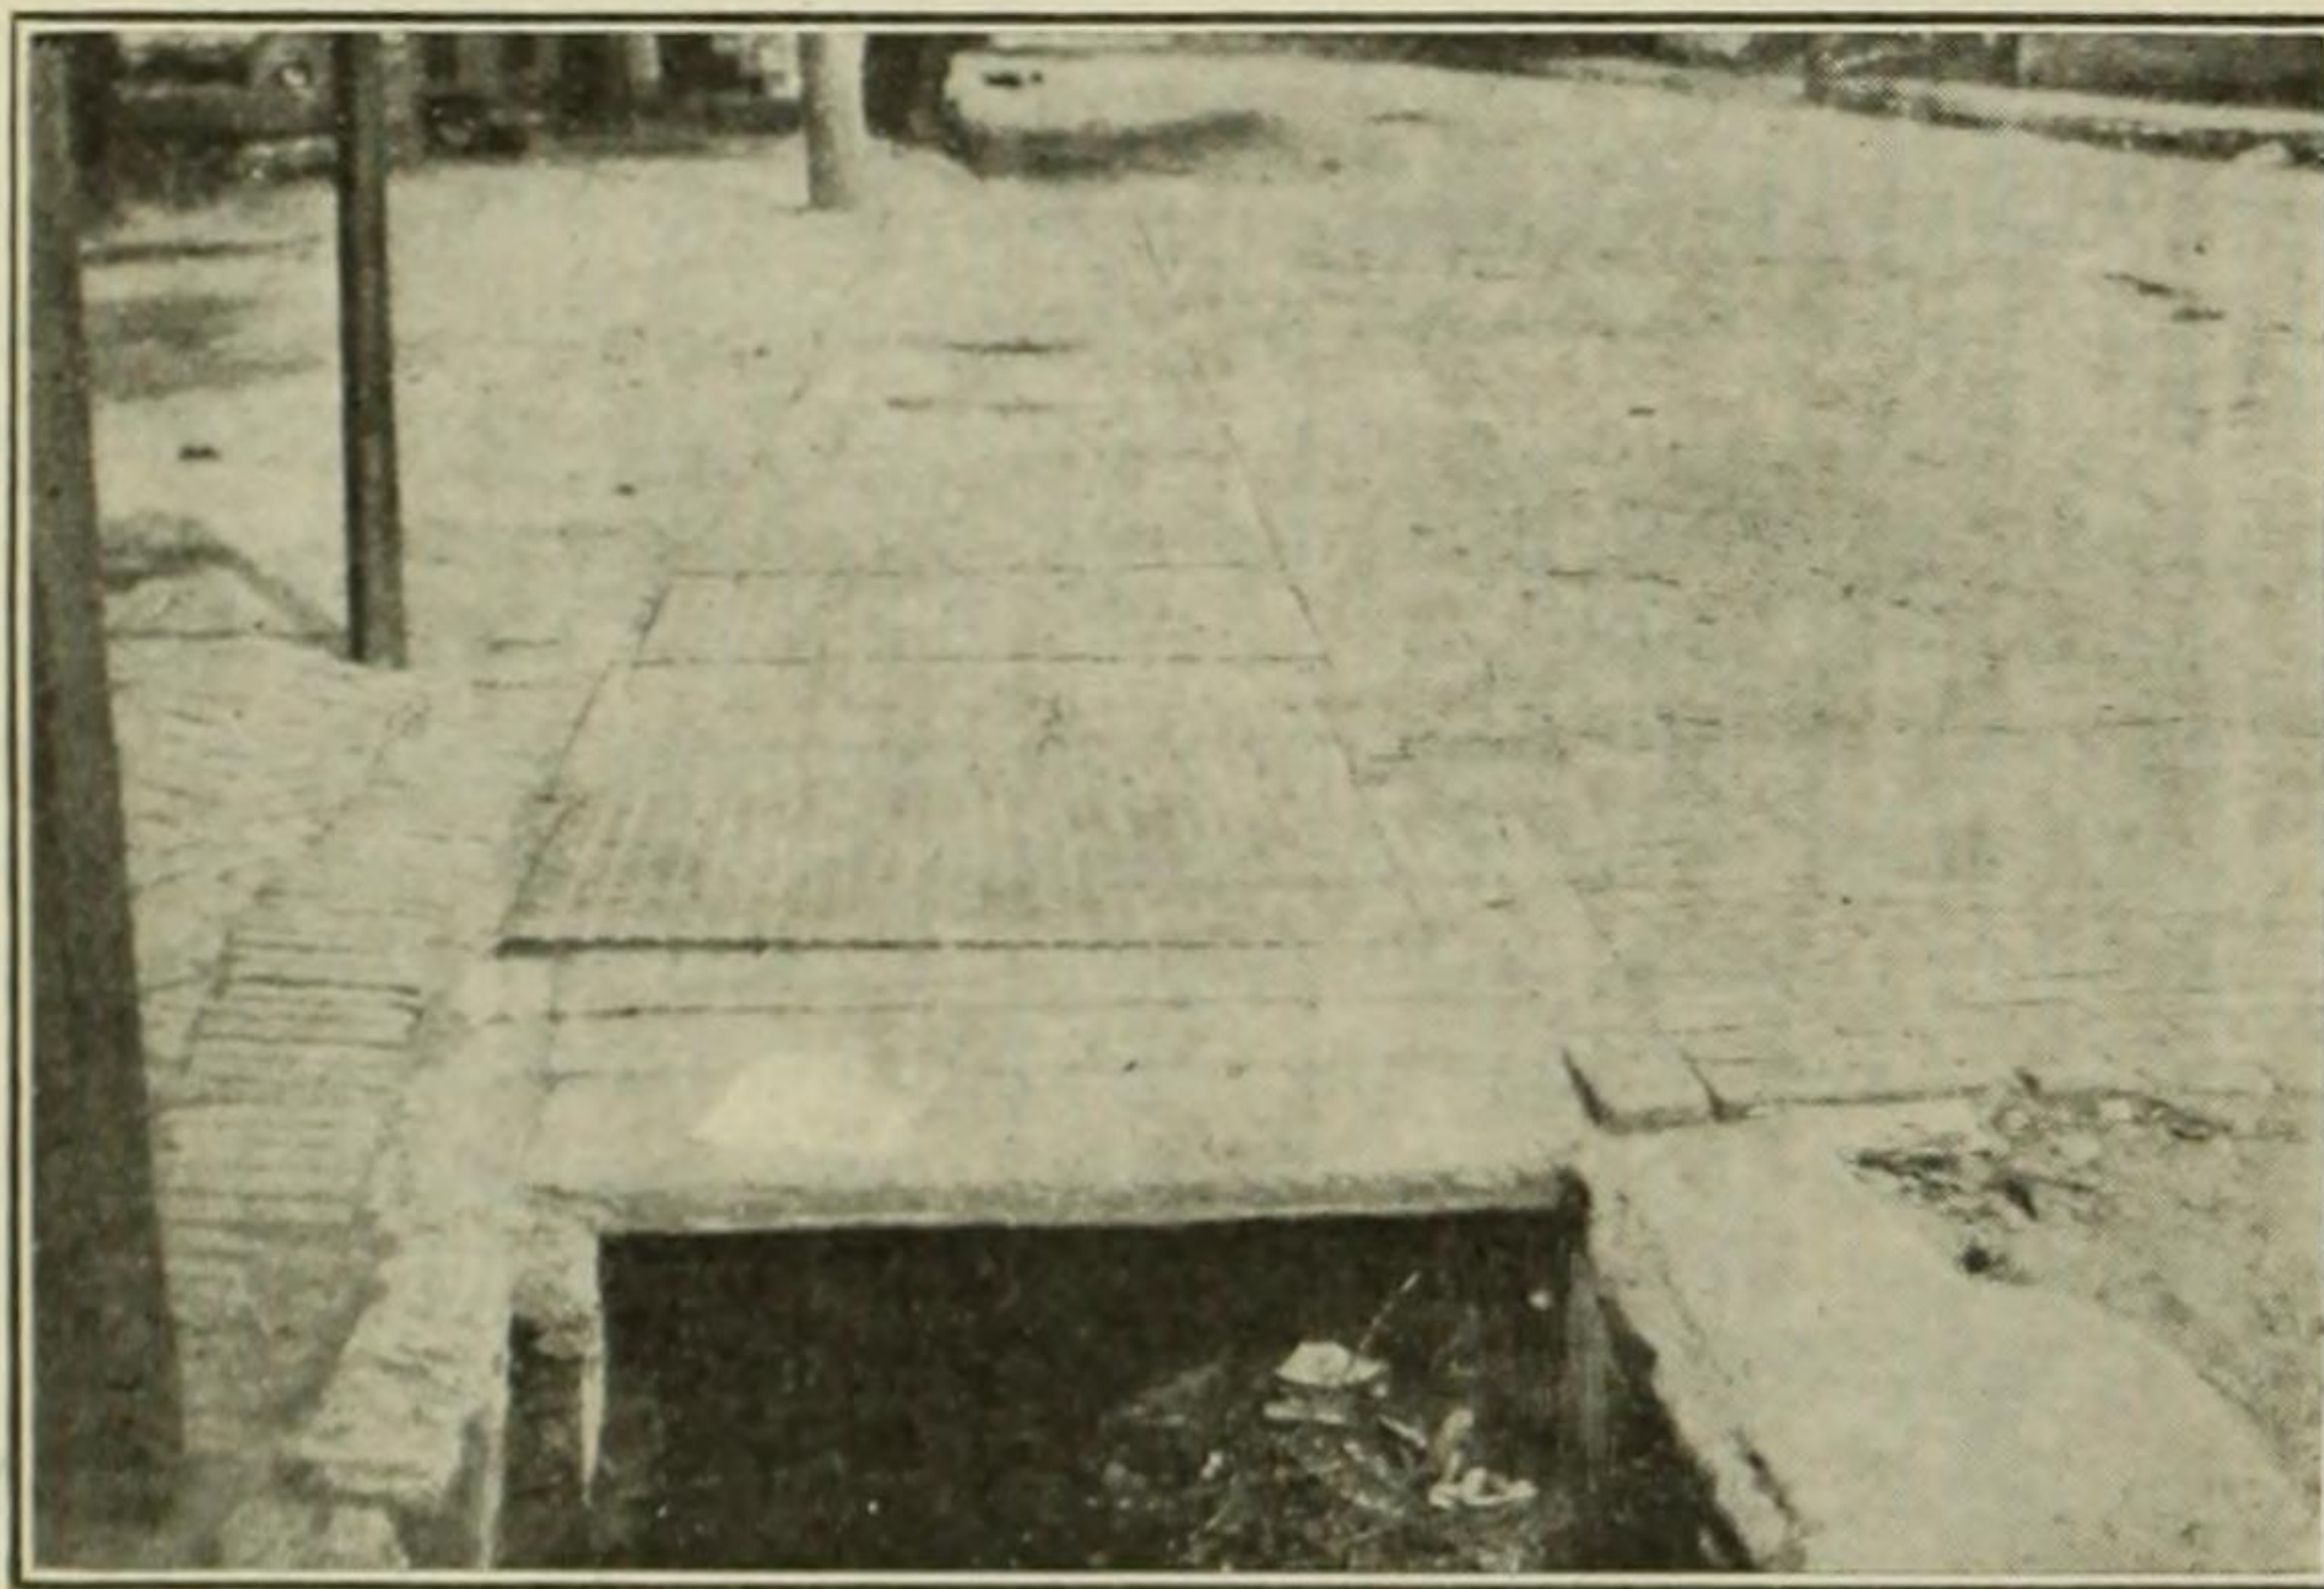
OLD-STYLE CAST-IRON PLATE CULVERT
